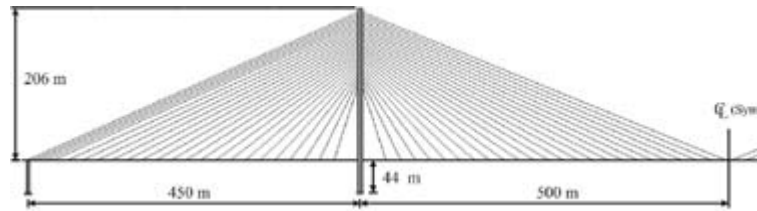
Three-span cable-stayed bridge with 1000 m span
